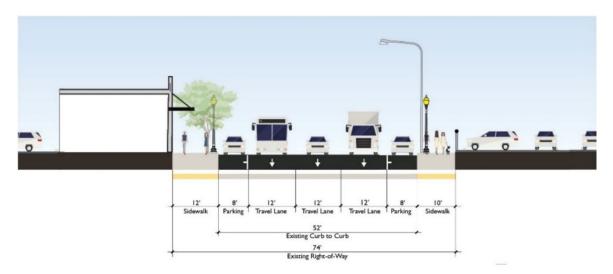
Existing Conditions Cross-section: Hedges Avenue to SR 180 - Blackstone Avenue (facing North)
